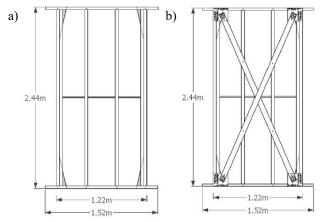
Shear wall configurations – CFS frame: a) steel frame with holdowns, and b) strap-braced shear wall
